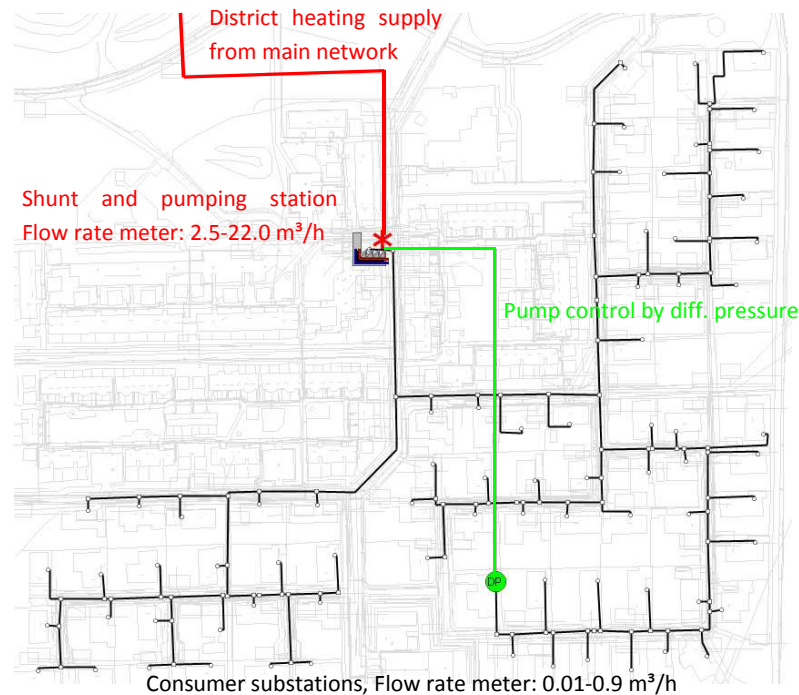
System Layout and pipe specifications. Main pipe (street) routing: “conti-produced” twin steel pipes, series 2. House-connection pipe routing: flexible twin alupex pipes, series 3. Both pipe types have diffusion barrier at the outer casing.
